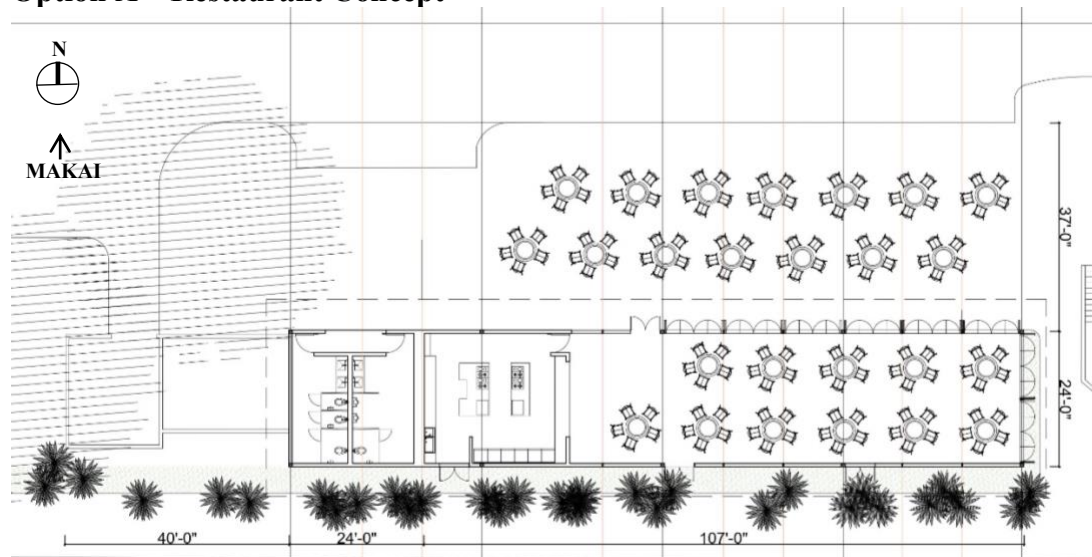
Conceptual architectural layout for a restaurant with indoor service and activation of the open outdoor space.
